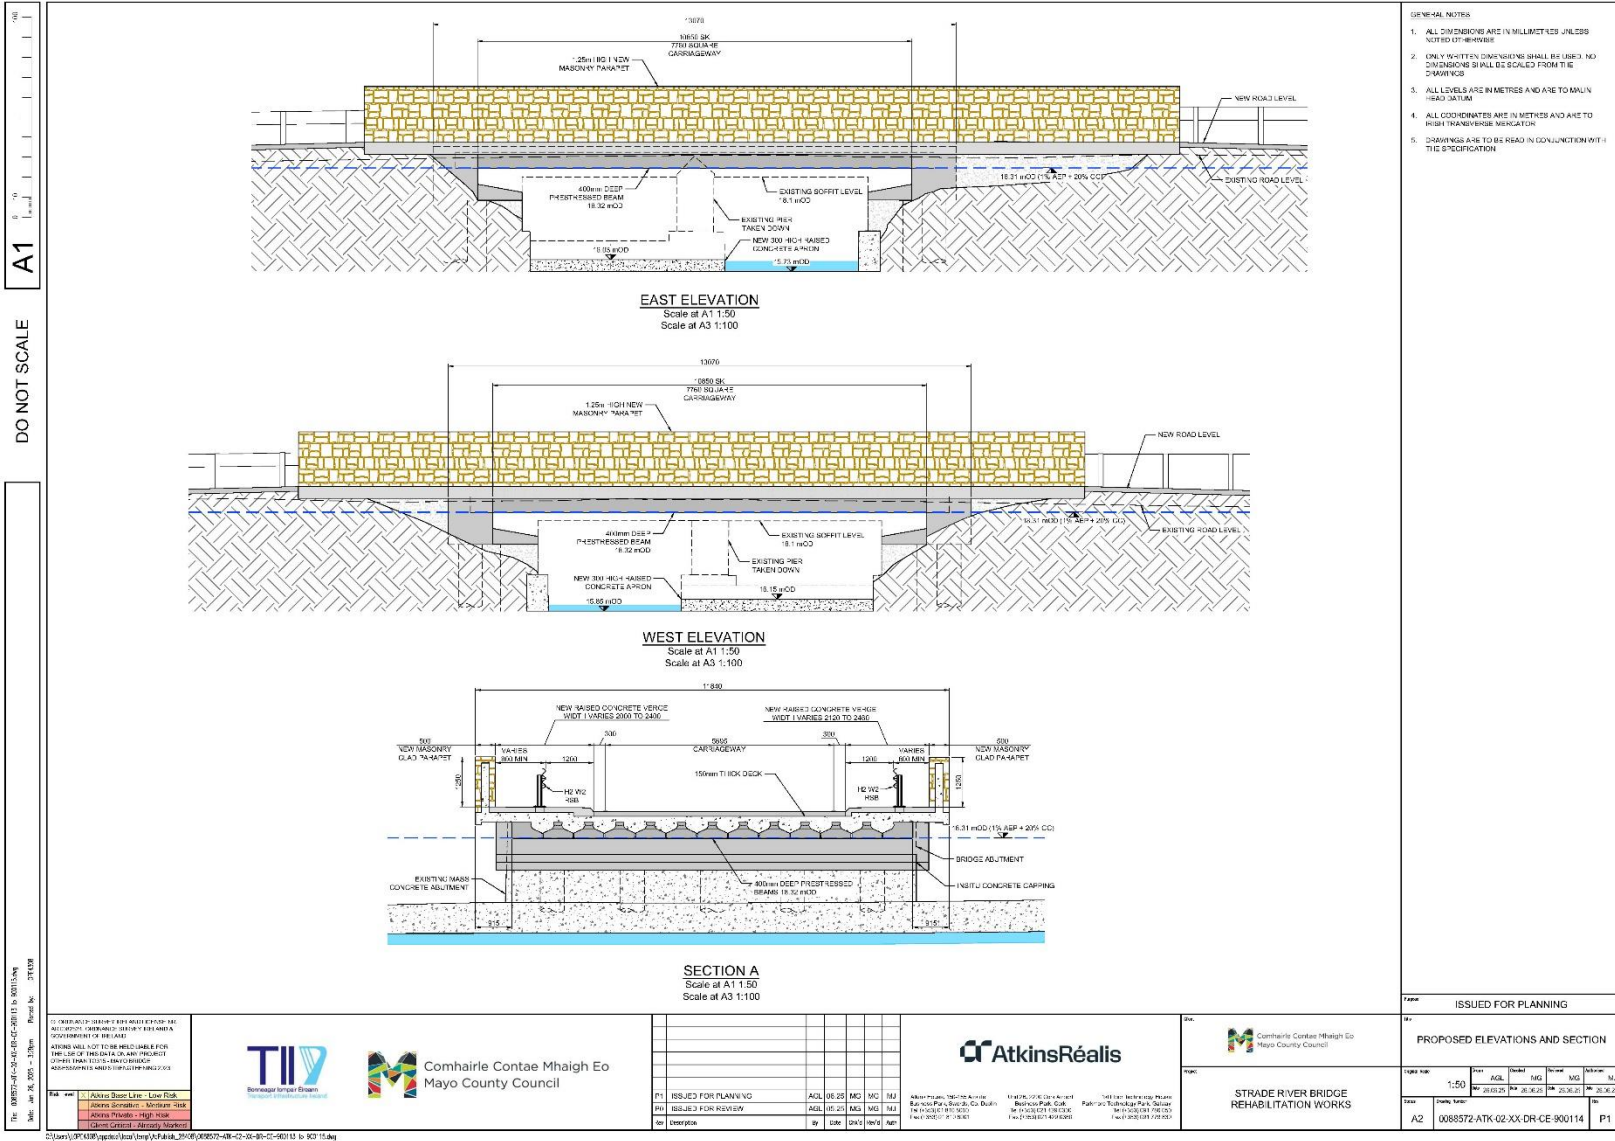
Proposed elevations and cross-section depicting pier removal and reinstatement of a concrete apron
